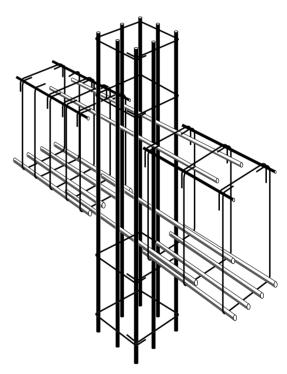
Show beam top (negative moment) steel distributed into the slab near the column. Beam top bars can be supported by C-shaped closers to the open stirrups.
